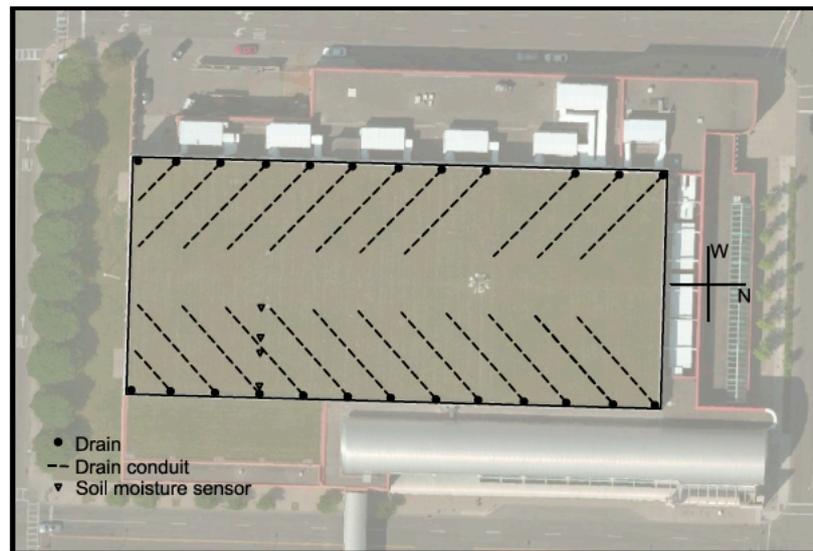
Location of roof drains and drain conduits on the OnCenter green roof. Soil moisture sensors located along a transect on the eastern side of the roof are shown.
